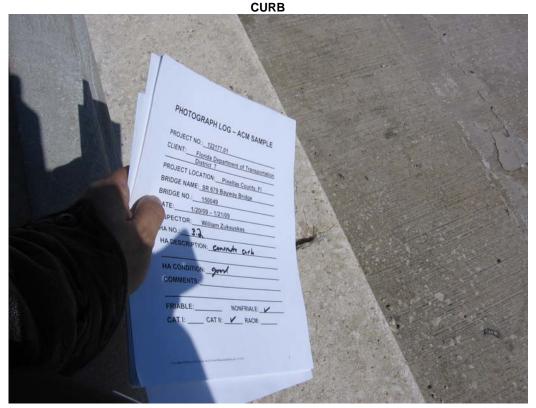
01/21/09 – SAMPLE 3.2 – HA 3 CONCRETE CURB
